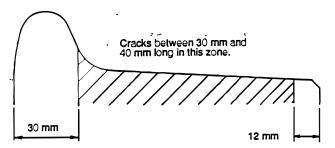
Class 3 rolling contact fatigue crack zone
